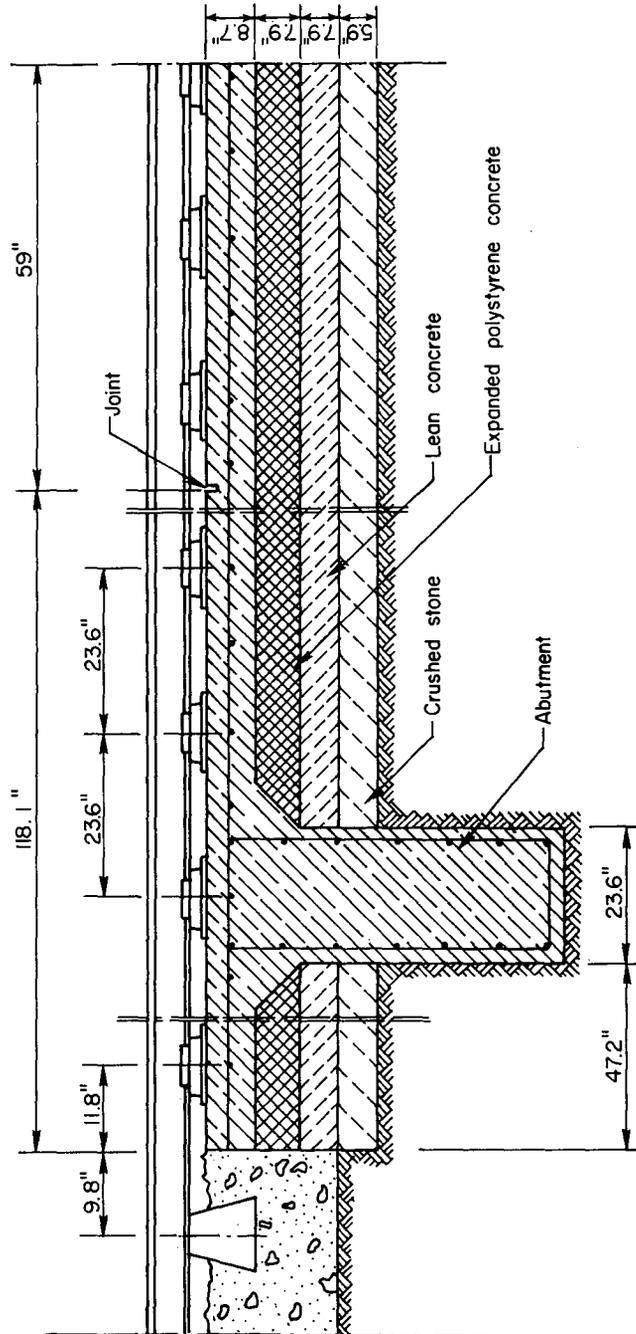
LONGITUDINAL SECTION OF SLAB TRACK AT OELDE
